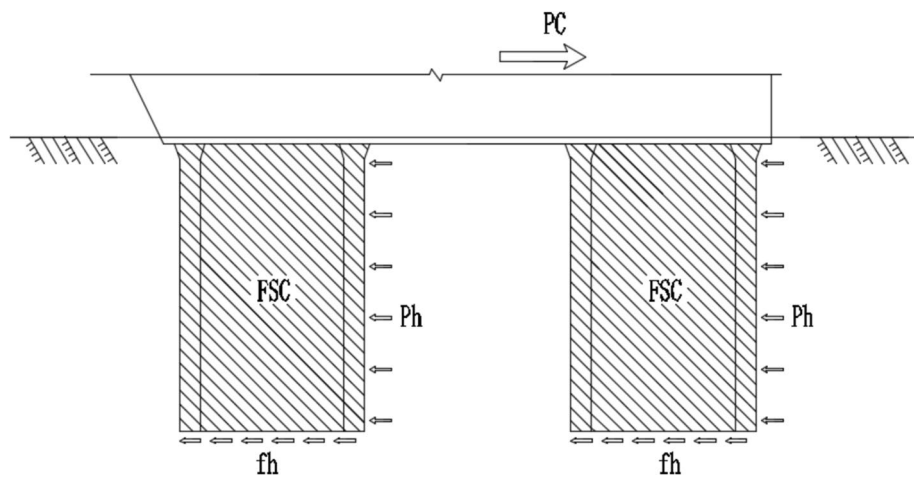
Plan of gravity anchorage with frame structure foundation (unit: metre)
